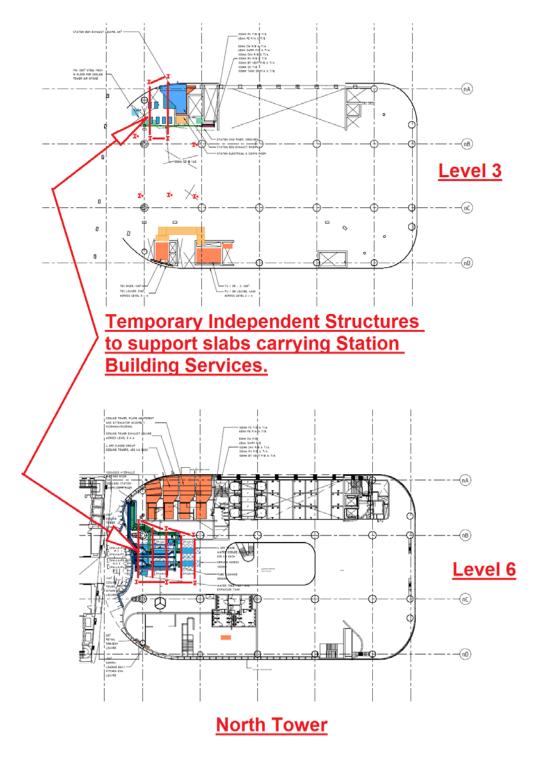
Temporary Support of Tower slabs supporting Station Building Services
